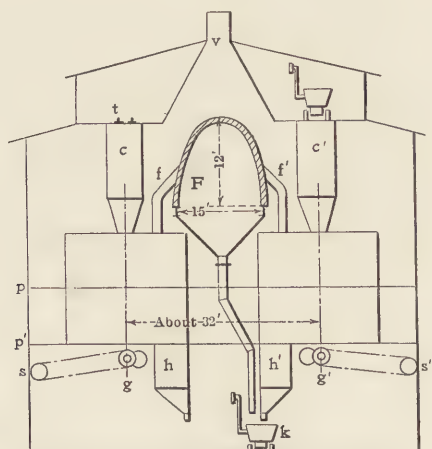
SECTION MC DOUGAL ROASTER HOUSE
